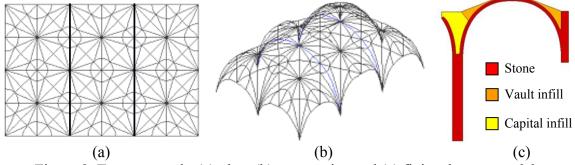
Transept vault: (a) plan, (b) perspective and (c) finite element model.
